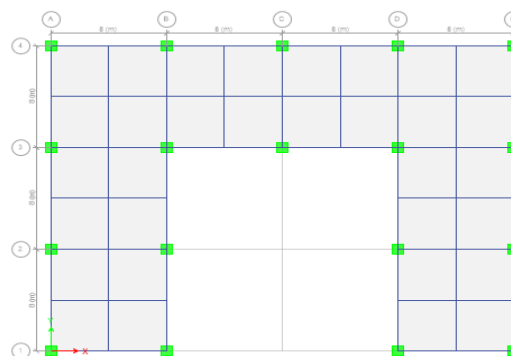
Plan Layout of Twenty Storey C- shape Building with Brick Infill Walls
